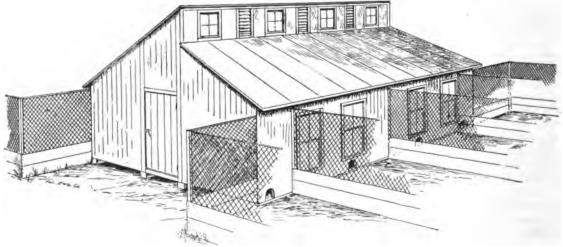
CONVENIENT POULTRY HOUSE (ELEVATION AND YARDS).
